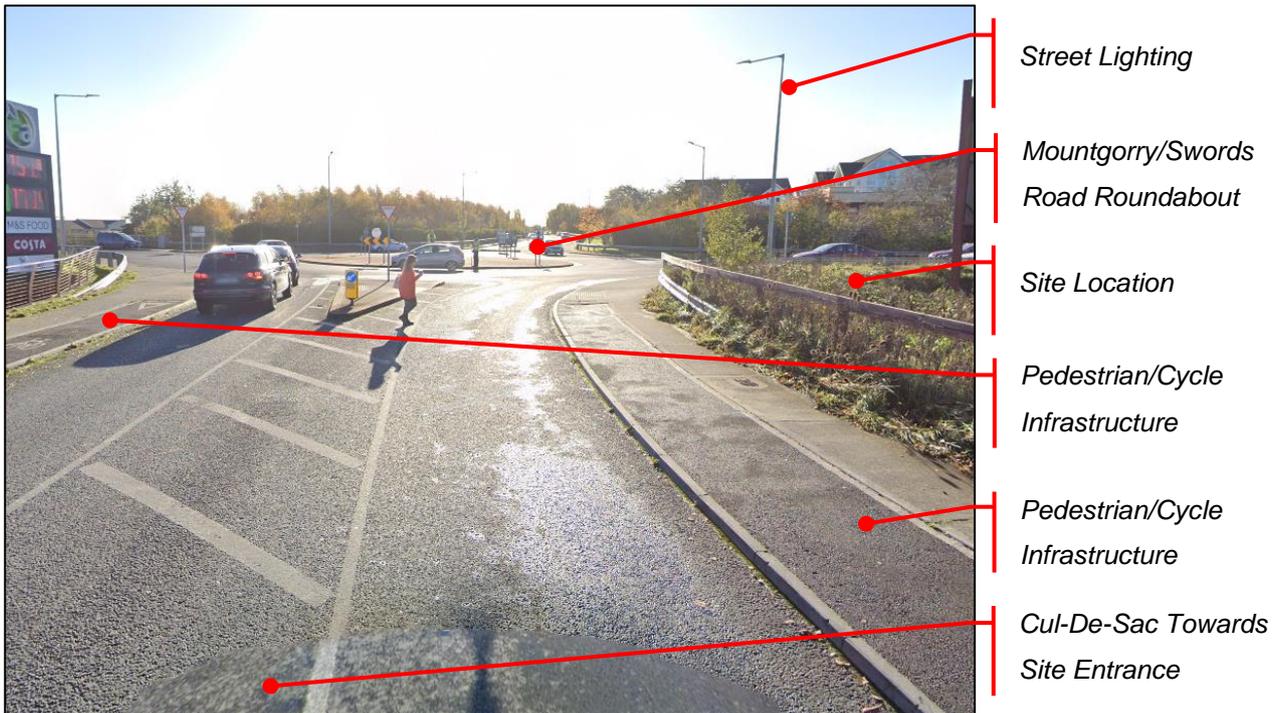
Existing Pedestrian Facilities – Access Road/Cul-De-Sac
